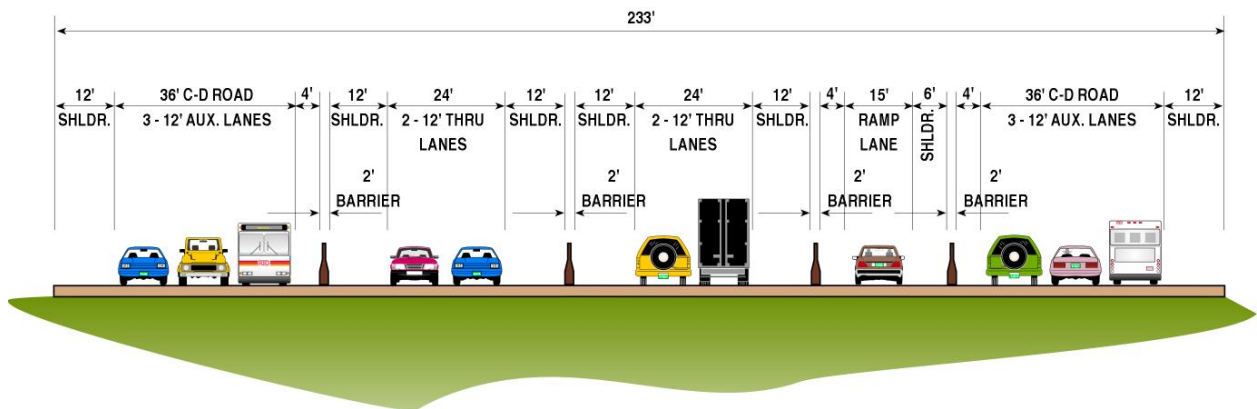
System Alternative 2, US 6 Typical Section, I-25 to Federal Boulevard
